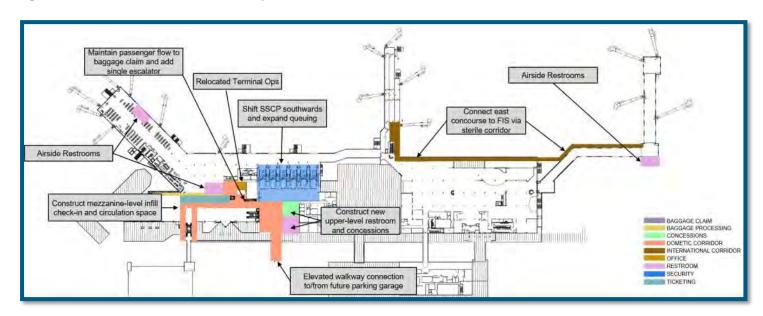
depicts the first-floor terminal services and Figure 5-18 depicts the second-floor terminal services as presented on Development Alternative 3.
